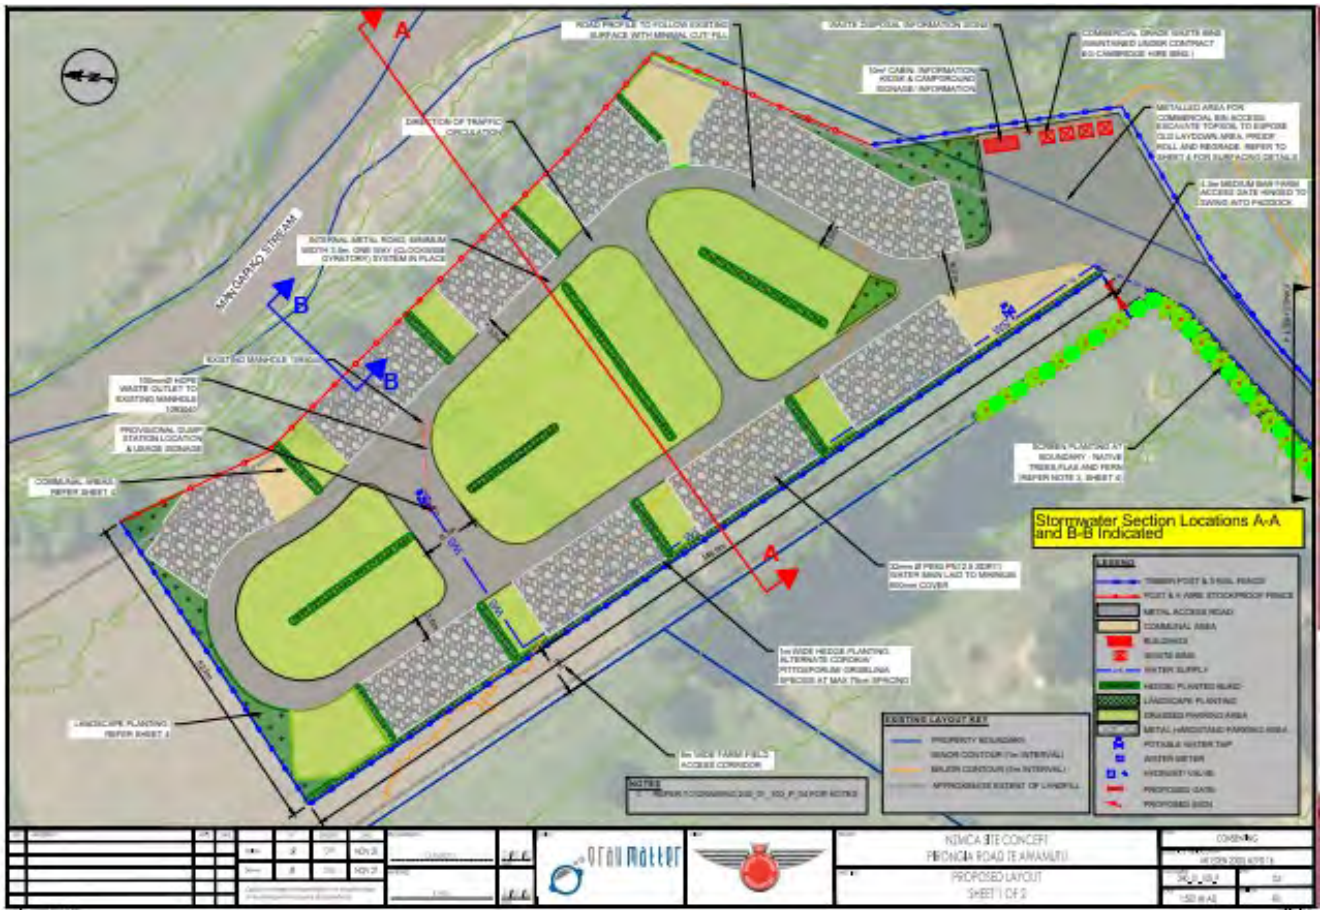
Proposed layout of the NZMCA Park located at Pirongia Road.
